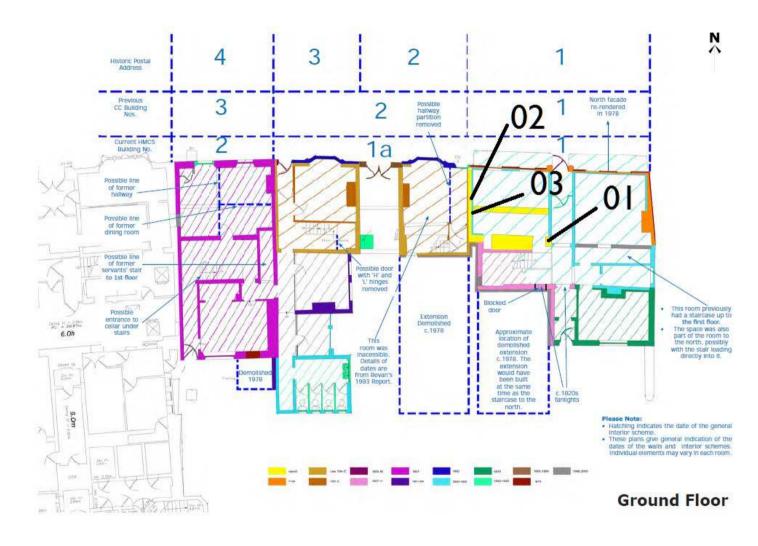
Plan of the ground floor of I-4 St Paul's Square, Bedford, showing the approximate locations of samples taken for dendrochronology. Adapted from an original plan (Purcell Miller and Tritton LLP 2009)
